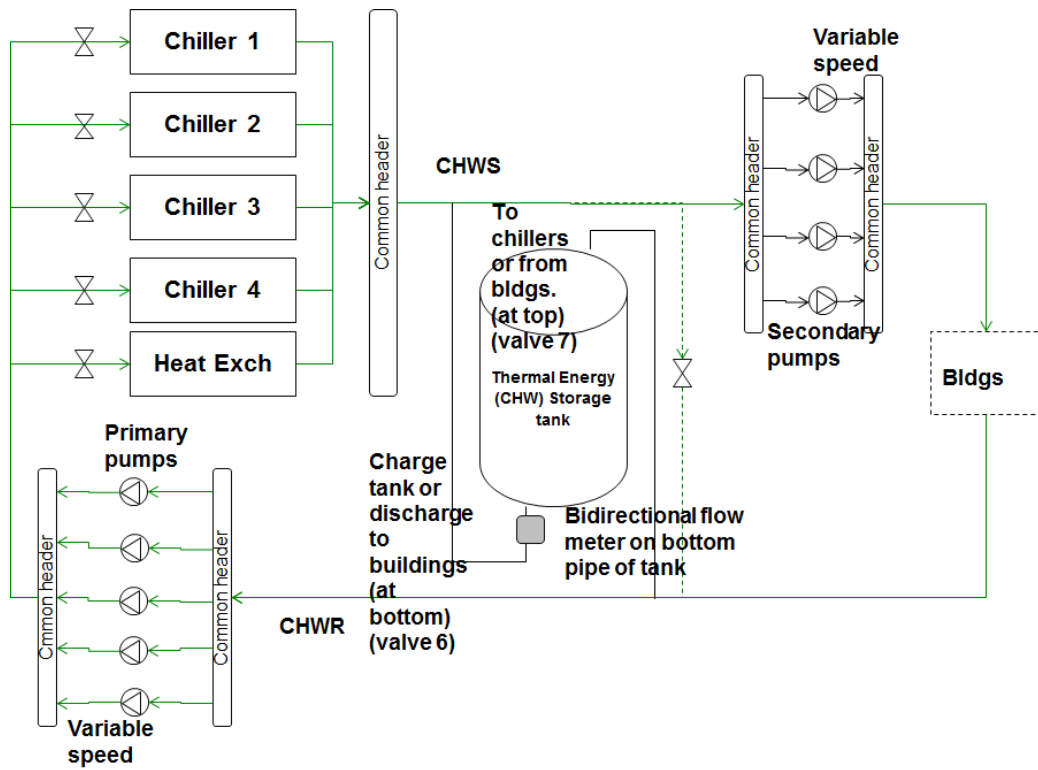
82nd Chiller Plant Layout – Evaporator Side
